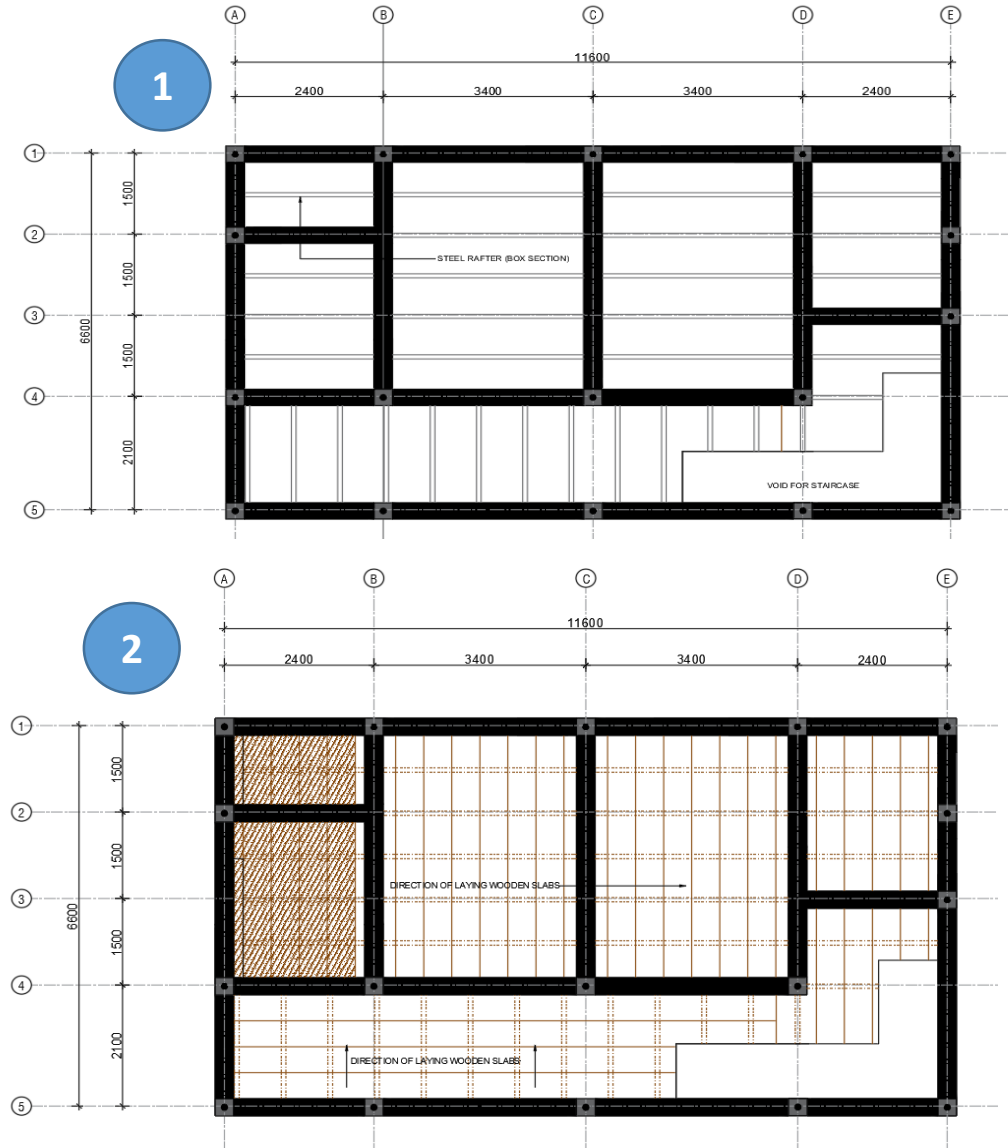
25. Positioning of wooden rafters on steel rolled box sections
